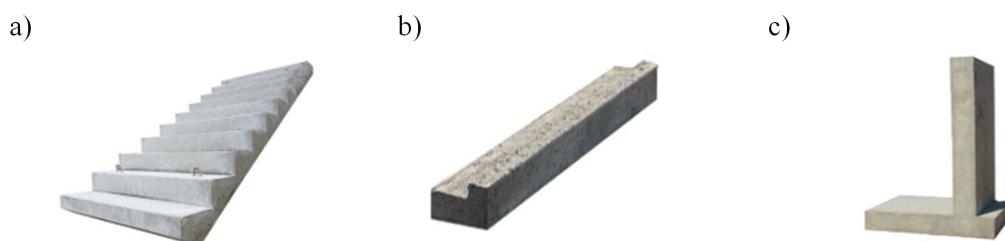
Examples of precast concrete elements: a) stairs, b) lintel, c) retaining wall [12]
